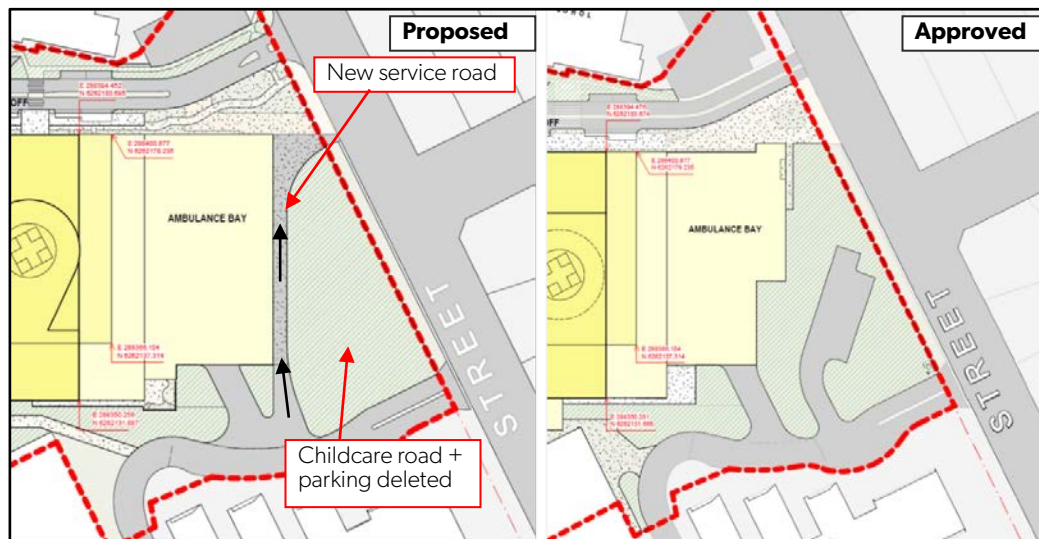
| Proposed (left) and approved (right) overall site plan showing the proposed access road (Source: Modification Application)
